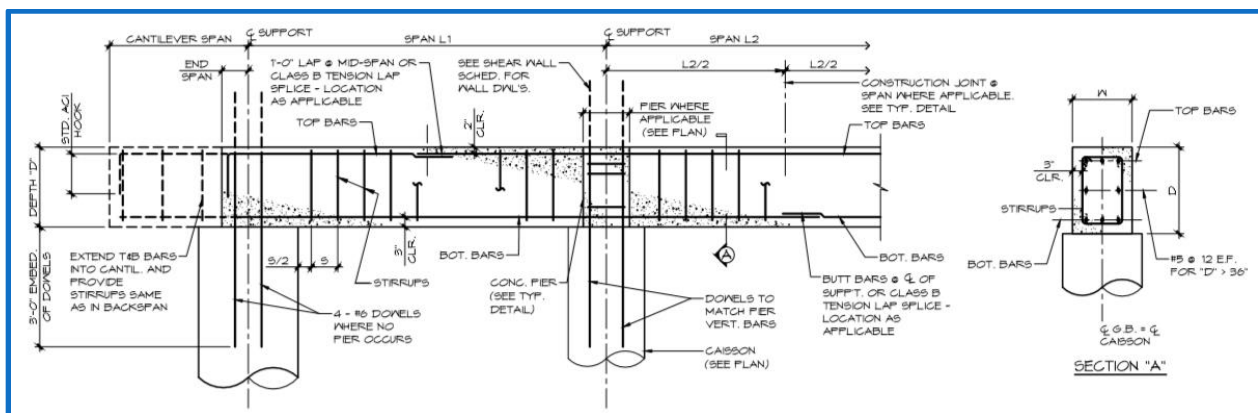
Grade Beam Reinforcement (Keystone Structural Solutions (KSS))
